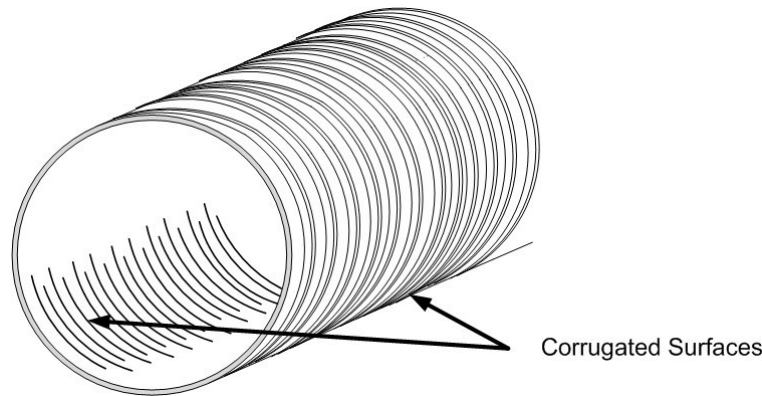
Schematic of a Single Walled Plastic Culvert
